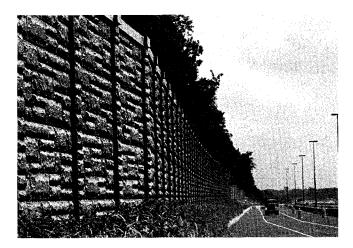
Ashlar stone finish on precast panel wall in Maryland.
